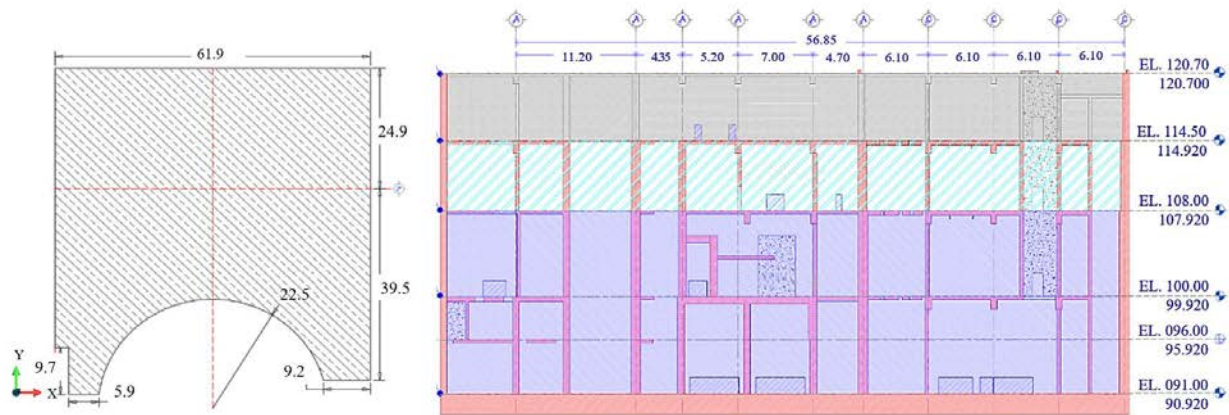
Geometry of the structural sub-model. Plan view (left) and elevation view (right).
